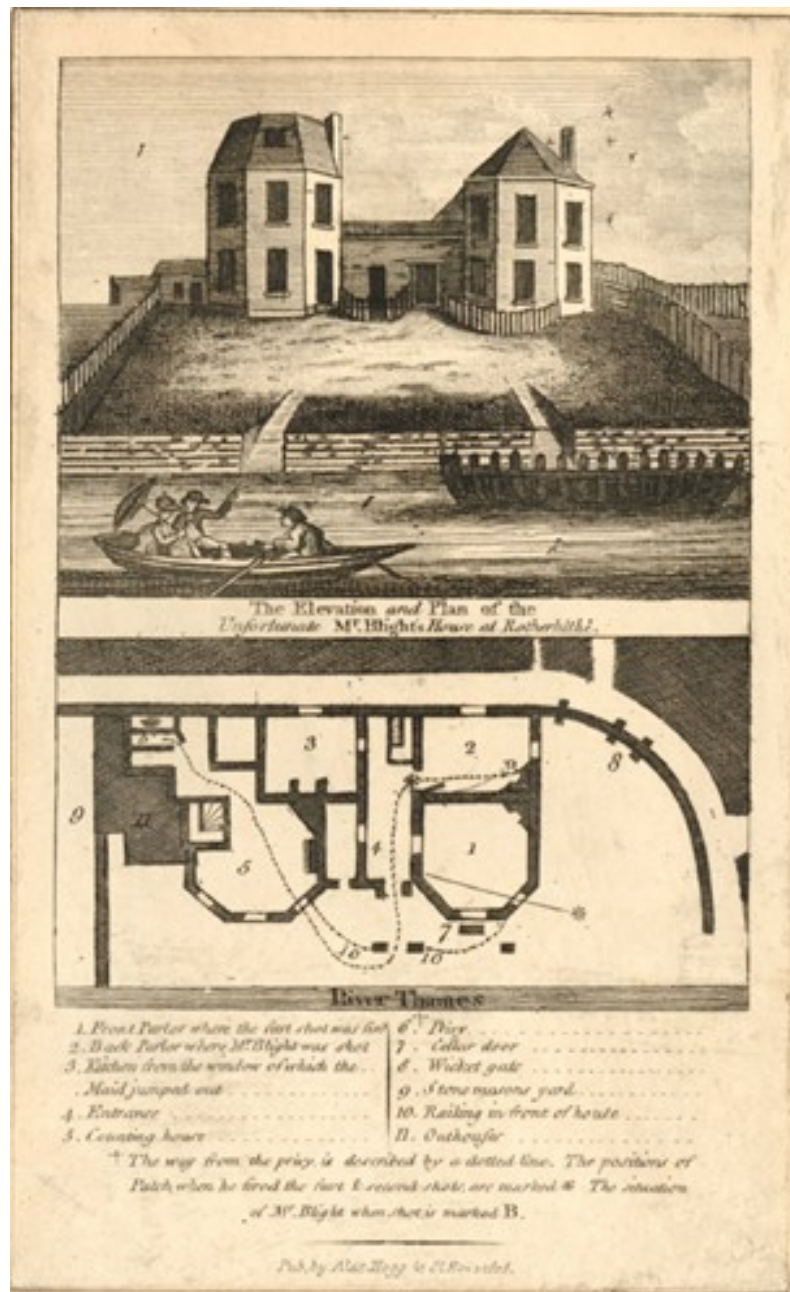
The Elevation and Plan of the Unfortunate Mr Blight's House at Rotherhithe (Hogg 1806). The print shows the elevation of the house as well as a labelled plan showing the route the murderer took through the house.
